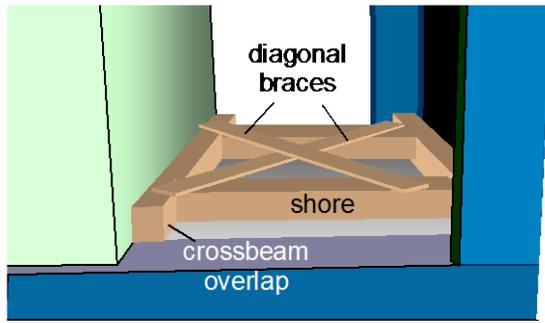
Shoring arrangement showing cross beam overlap and diagonal braces
